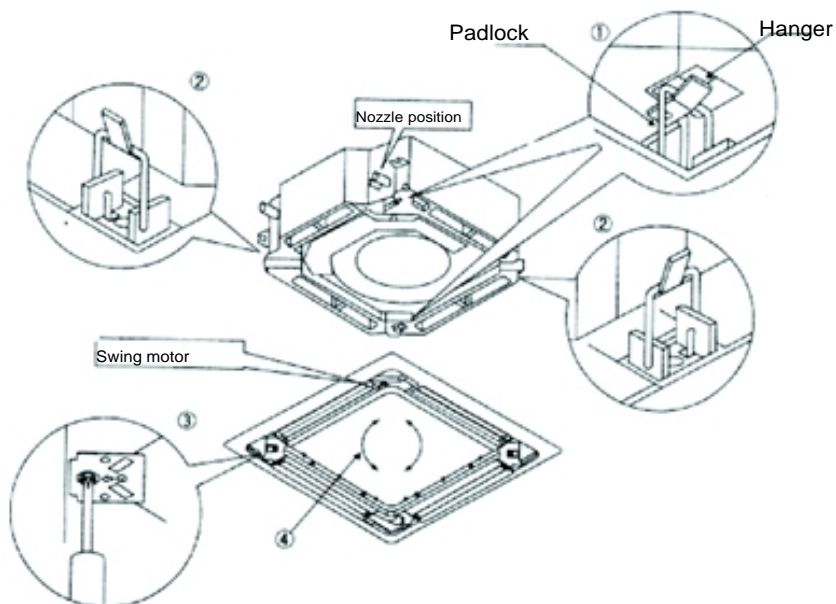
6 Installation order of the panel for Ceiling Cassette Unit
